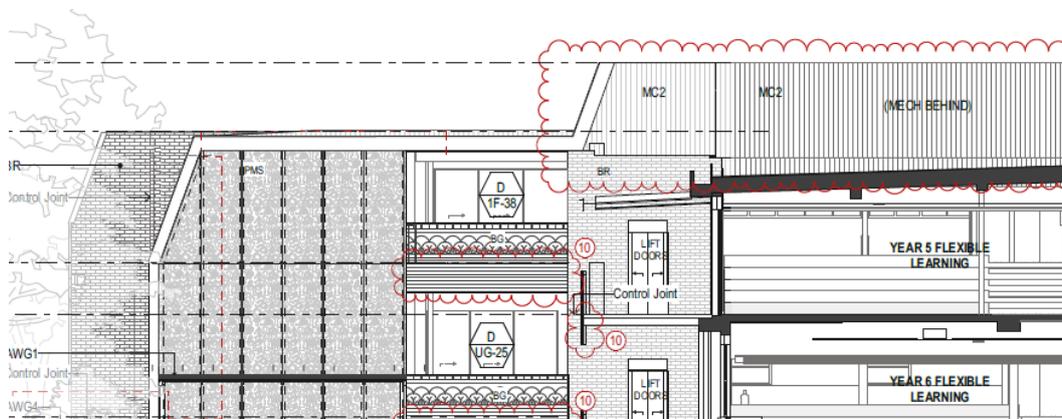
Proposed mechanical plant screen/enclosure – east elevation extract
